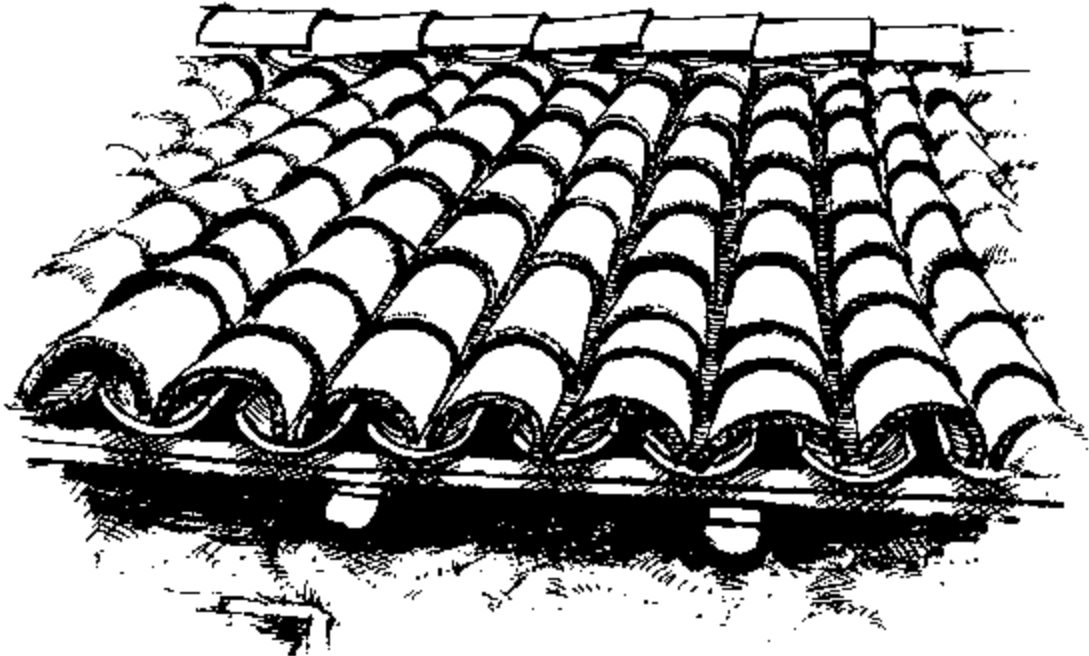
Tiles are a suitable traditional roofing material for the improvement of houses.
